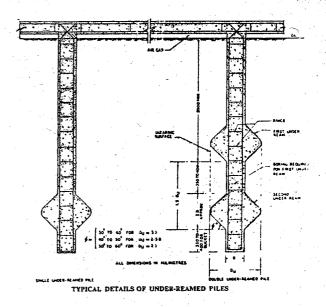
SINGLE AND DOUBLE BULBED UNDER-REAMED PILES.
